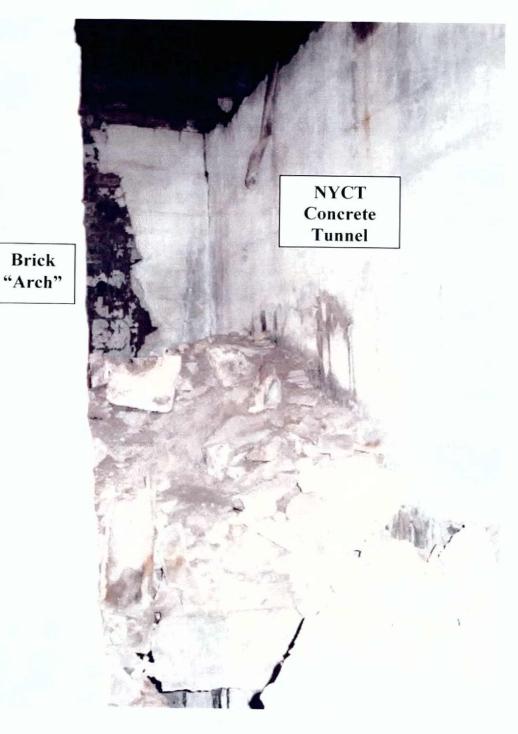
TP-2: Looking West-Bottom of brick wall 11 feet deep from grade.
